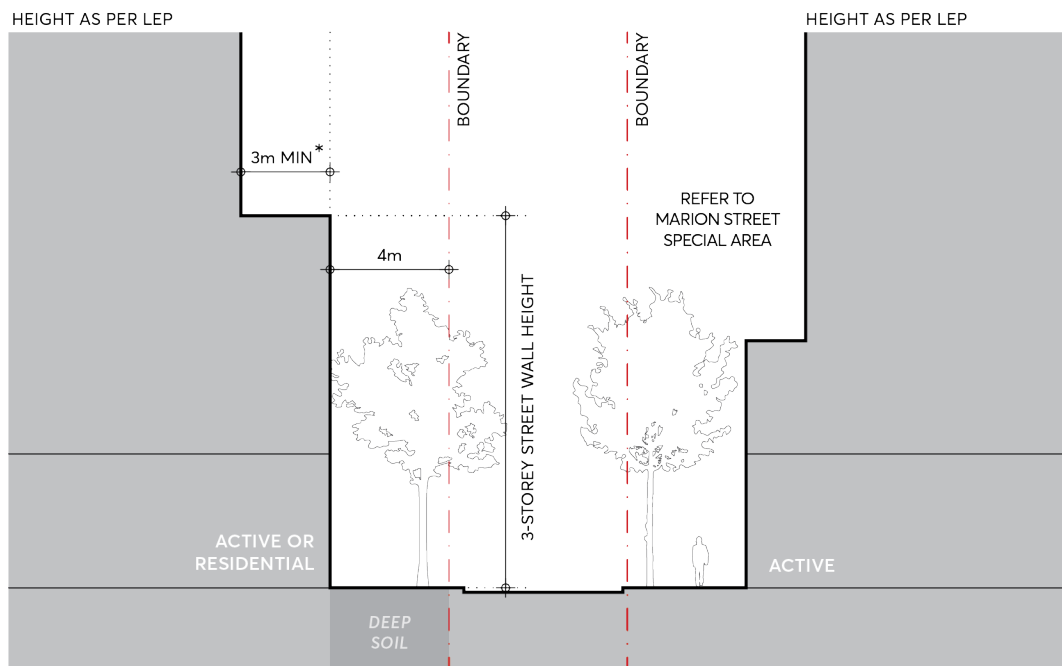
Raymond Lane (Section C) Setbacks and Street Wall Height
